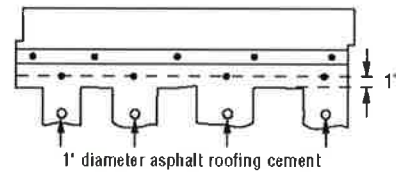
Fastening Presidential and Presidential TL Shake shingles on steep slopes.
